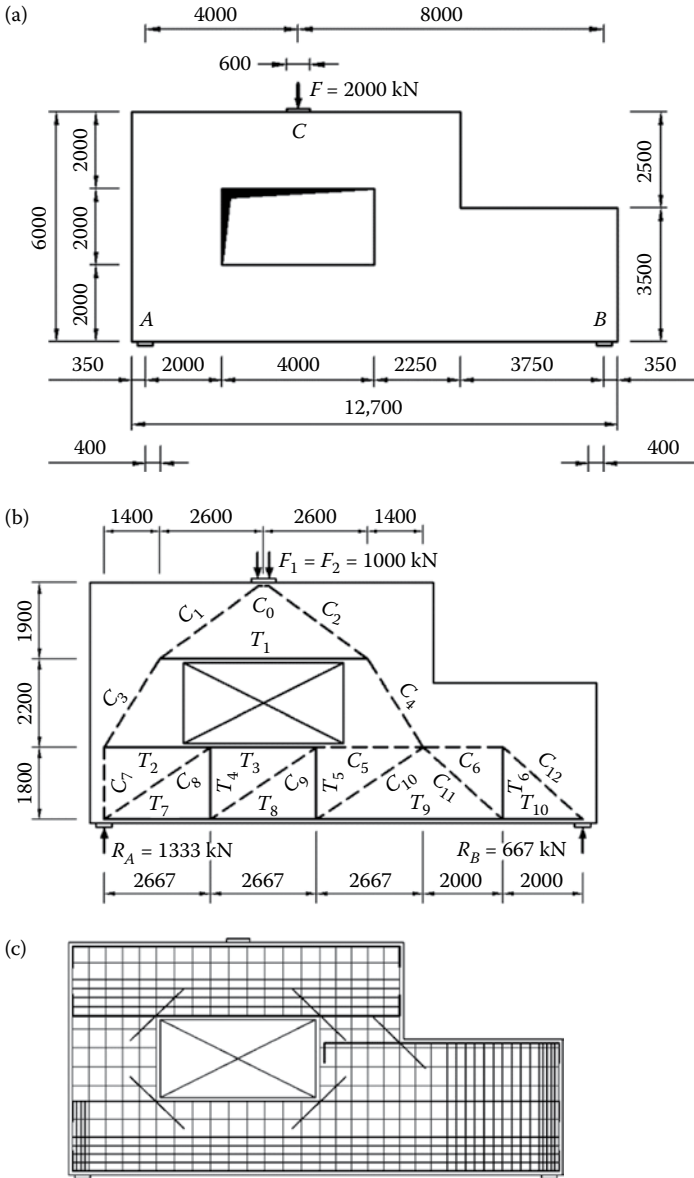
Example of deep beam with large opening: (a) beam geometry and loading. (b) STM. (c) Reinforcement arrangement.
